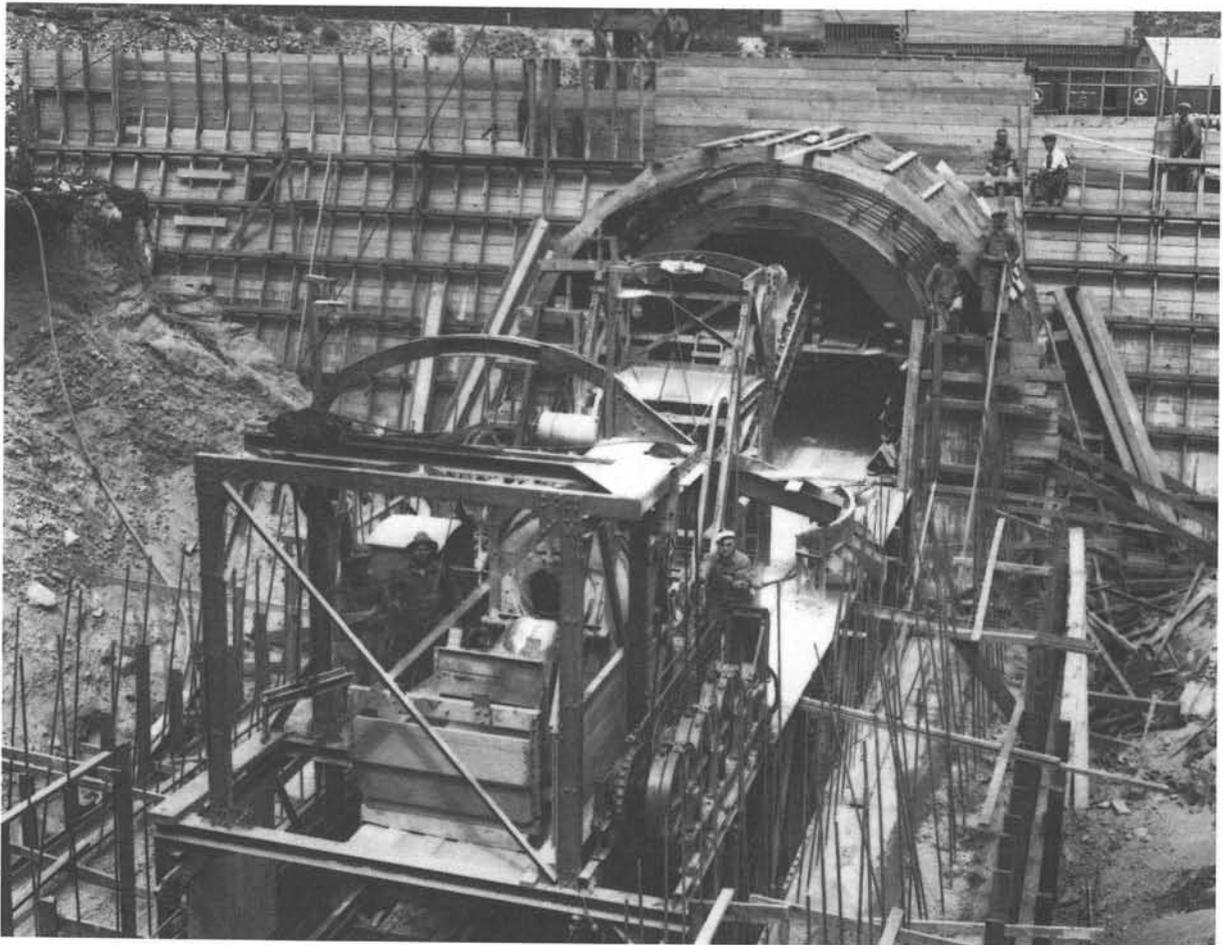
Concrete jumbo at east portal. Courtesy of Special Collections Division, University of Washington Libraries. Photo by L. Pickett, negative 3550.
